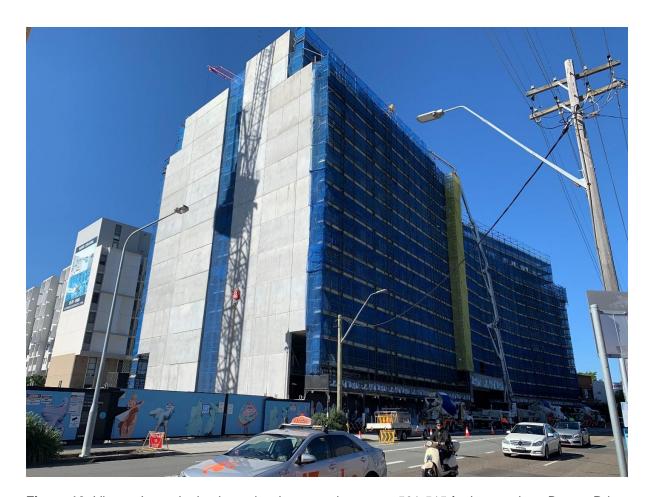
View to Lateral mixed use development site at nos. 501-515 further south on Botany Rd.
